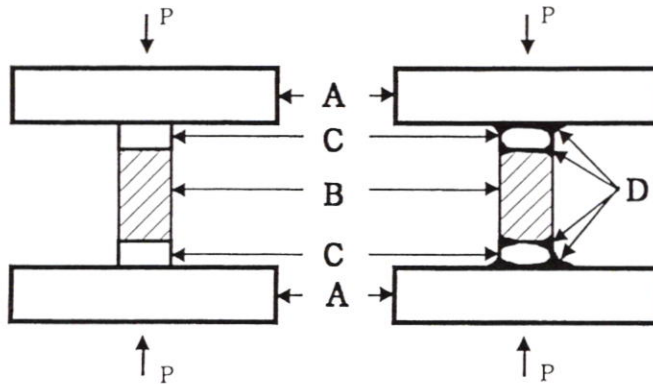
Contact between specimen and bearing plate. A: Bearing plate, B: specimen, C: head, D: water (ice) or adhesive.
